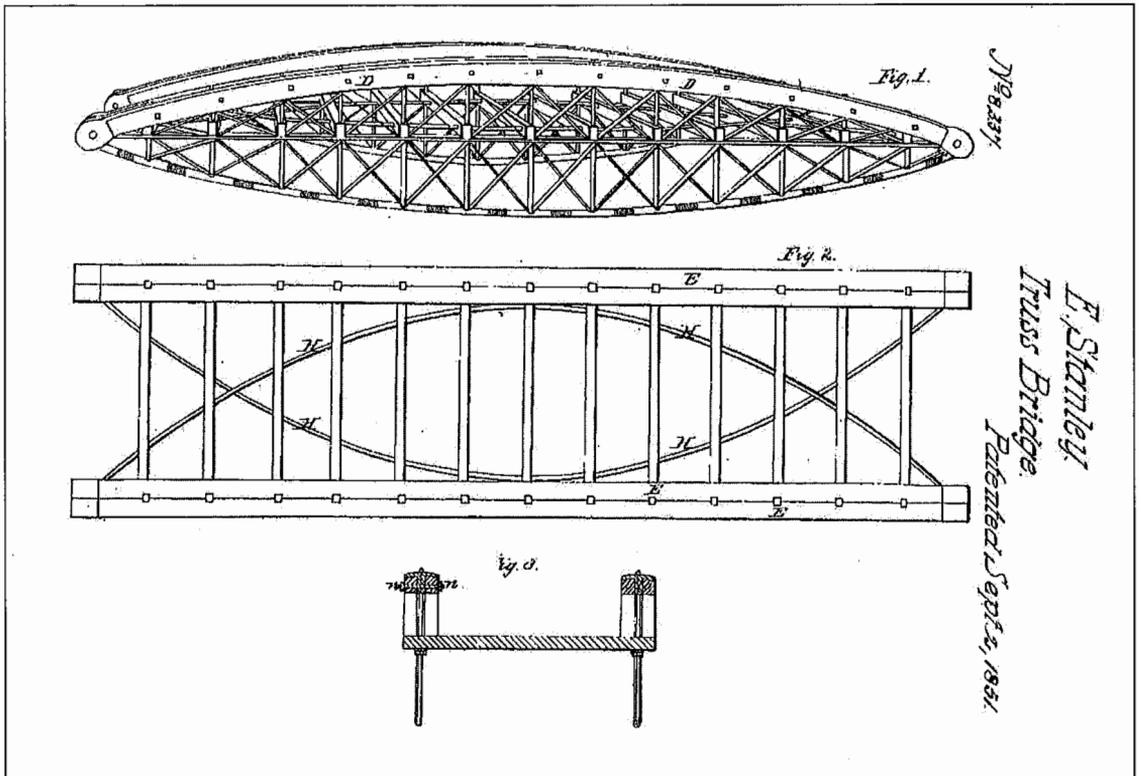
Patent drawing of the 1851 Stanley "truss bridge."
